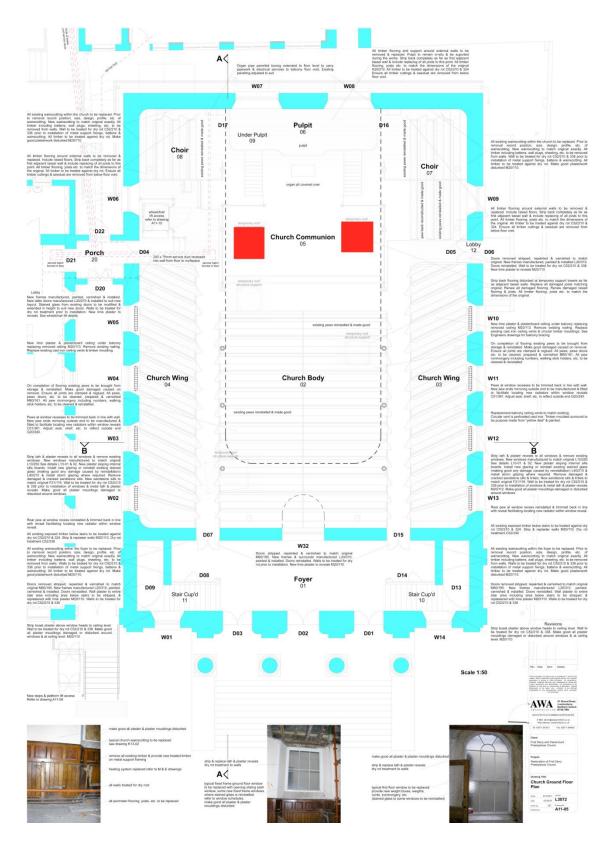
Floor Plan of First Derry Presbyterian Church showing (in red) location of proposed evaluation trenches
